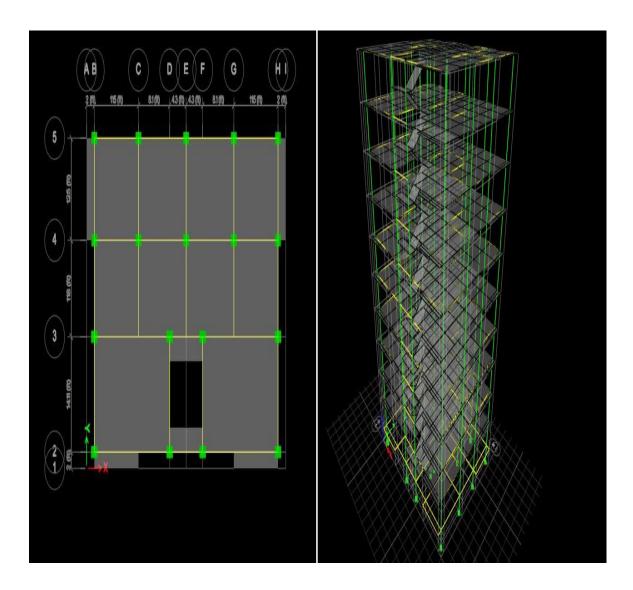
Drawing of Column, Beam, Grade beam, Slab, Stair.
